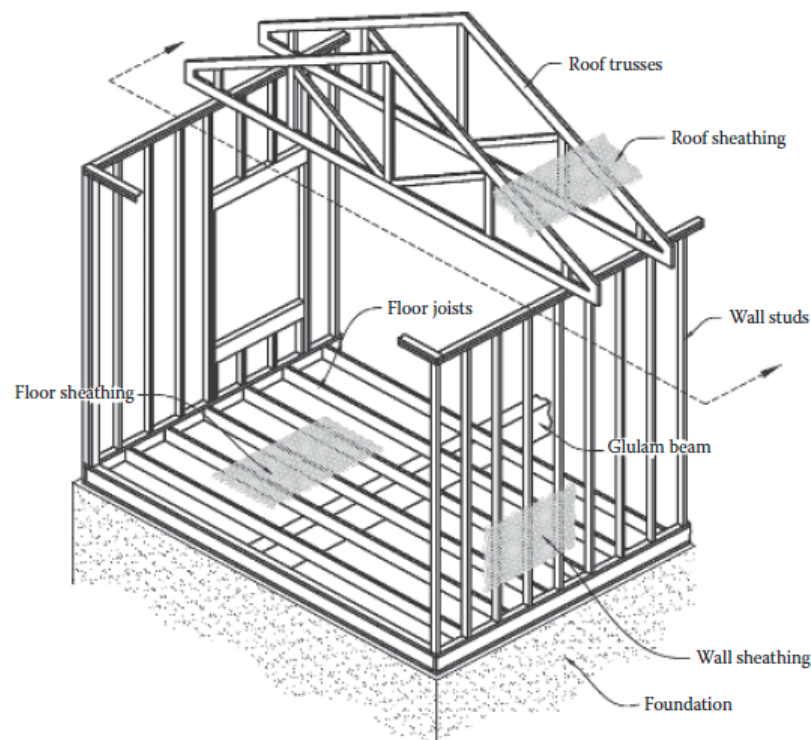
Typical structural elements (Courtesy of Aghayere & Vigil [1]).
